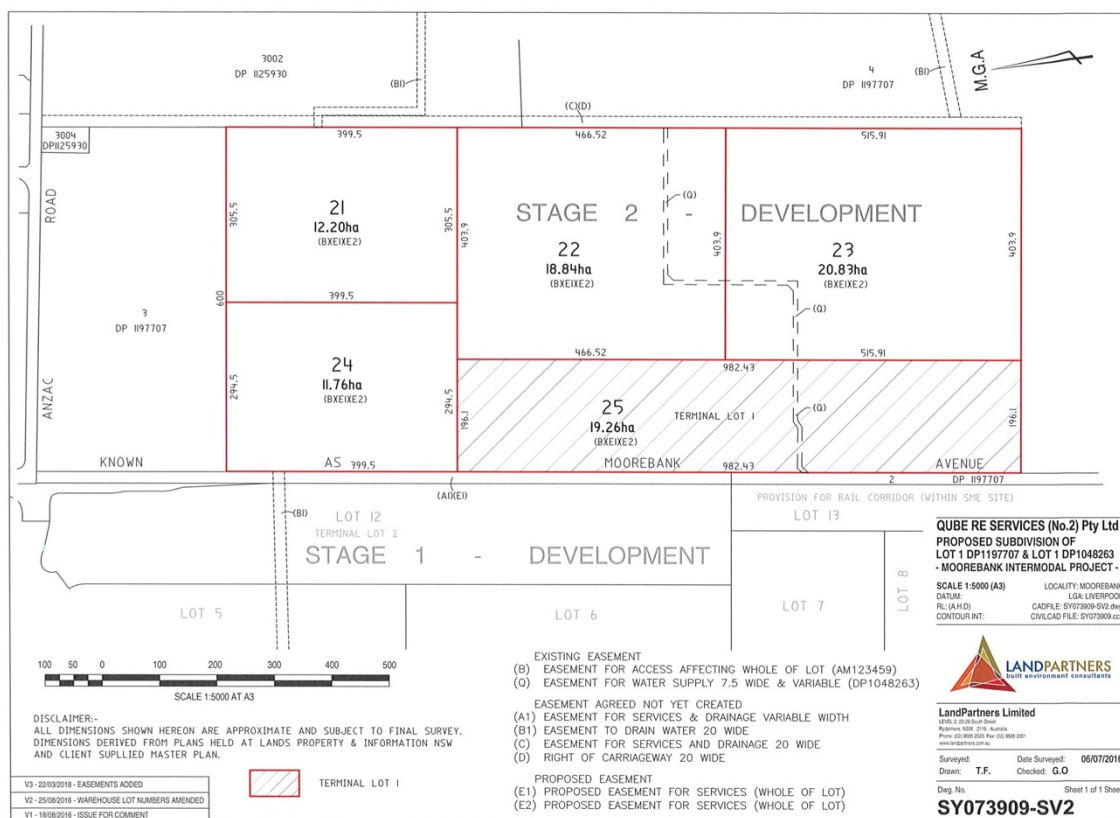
MPE SSD 7628 Subdivision Plan – Lot Dimensions
